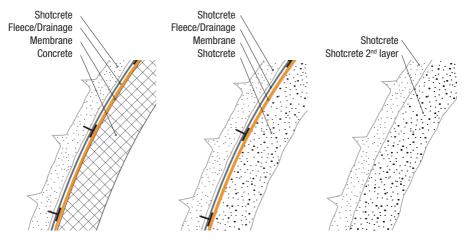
Tunnel lining with shotcrete, membranes, concrete
